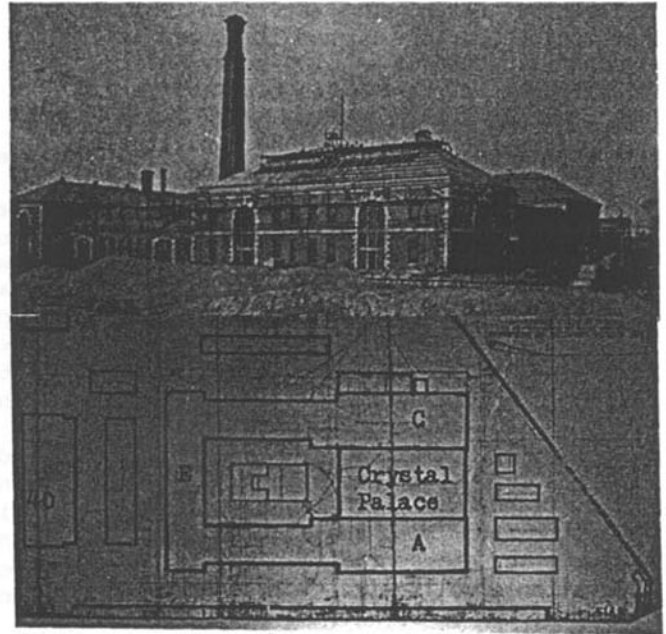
(Top) Photo of Building 42 during roof and craneway restructuring of 1902. (Bottom) Plan of original quadrangle with crystal palace infill.
